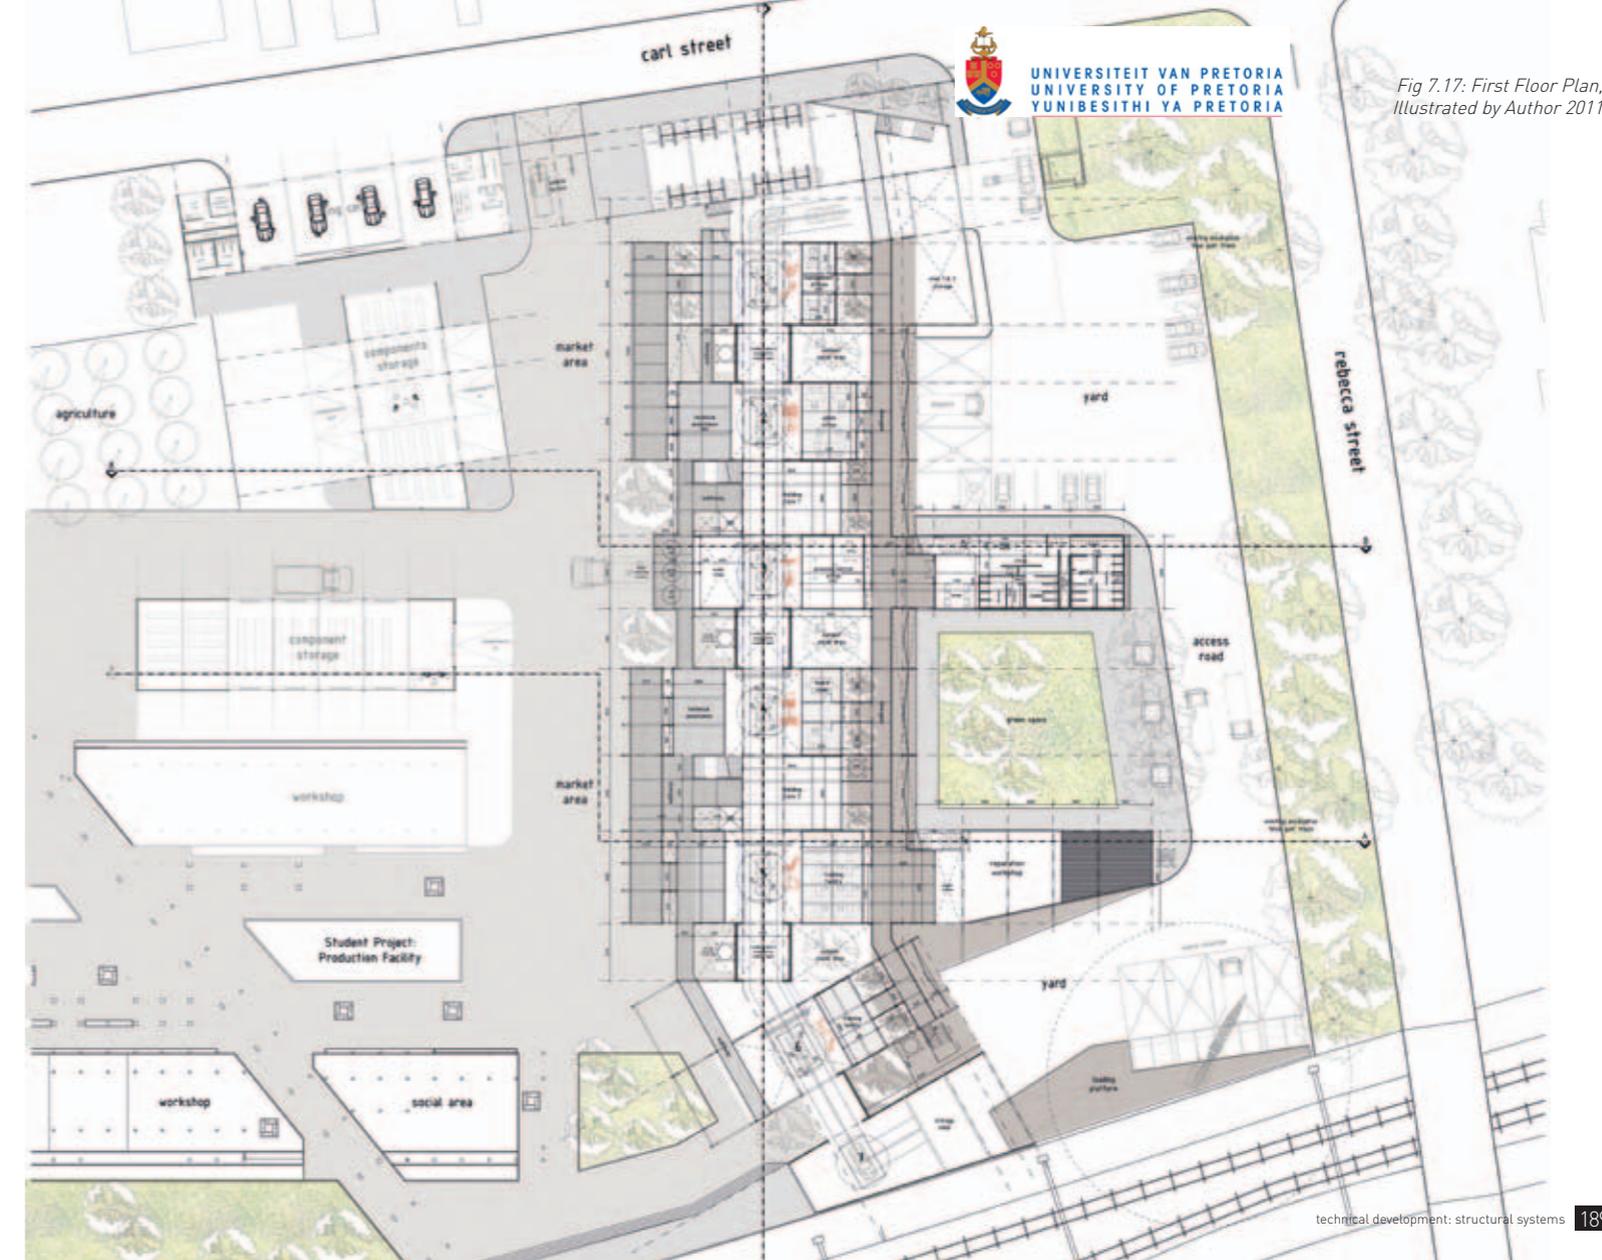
First Floor Plan, Illustrated by Author 2011
